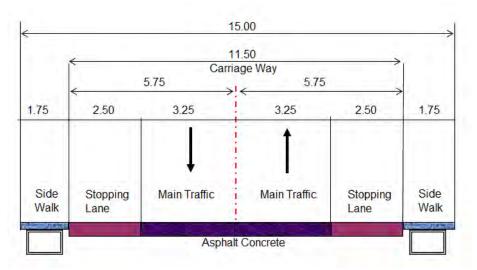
Typical Cross Section: Section II (After Improvement)
